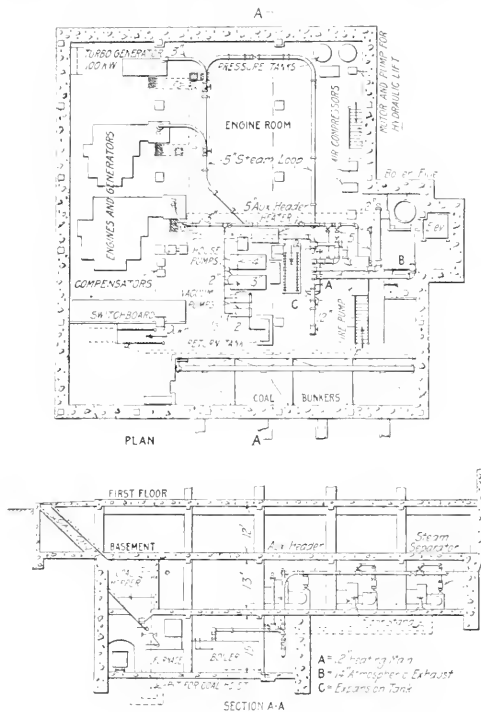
PLAN OF ENGINE ROOM AND ELEVATION THROUGH PLANT
